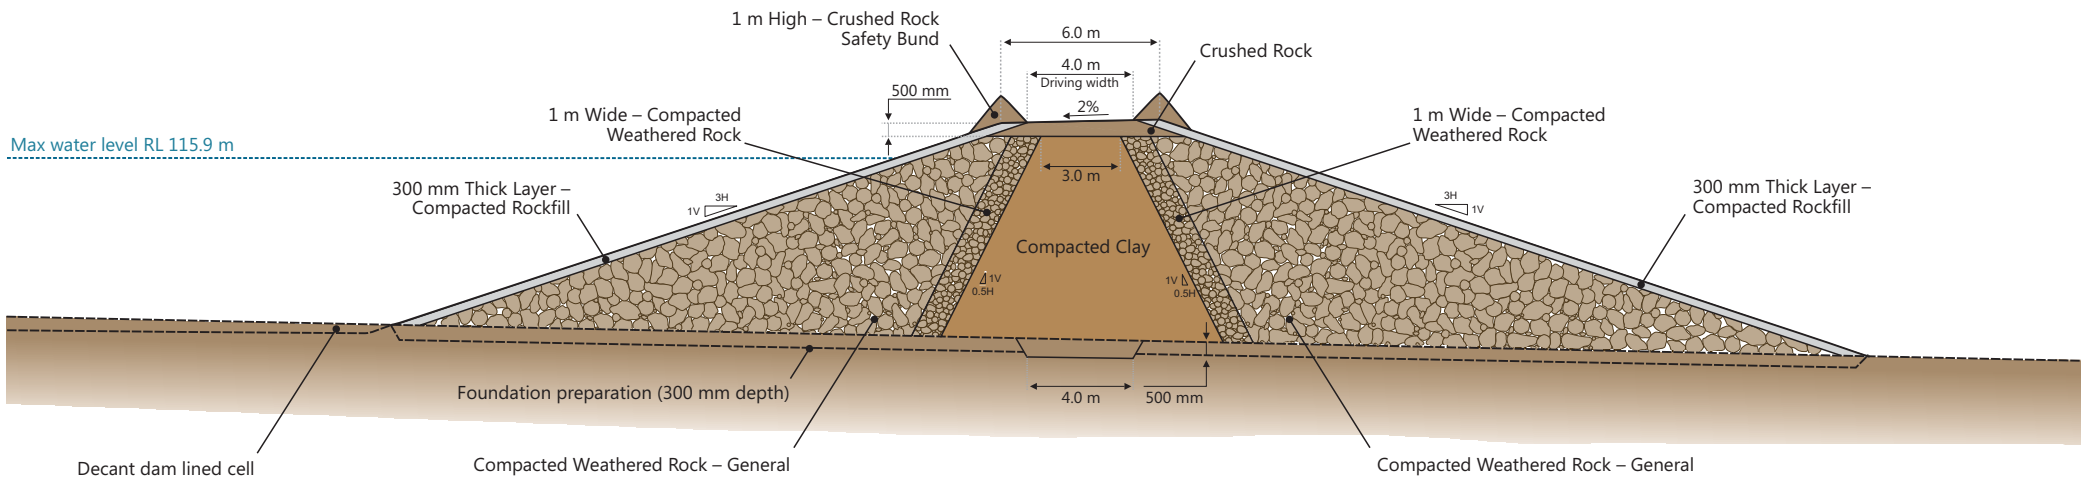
Tailings Storage Facility Decant Dam Embankment Cross-Section
